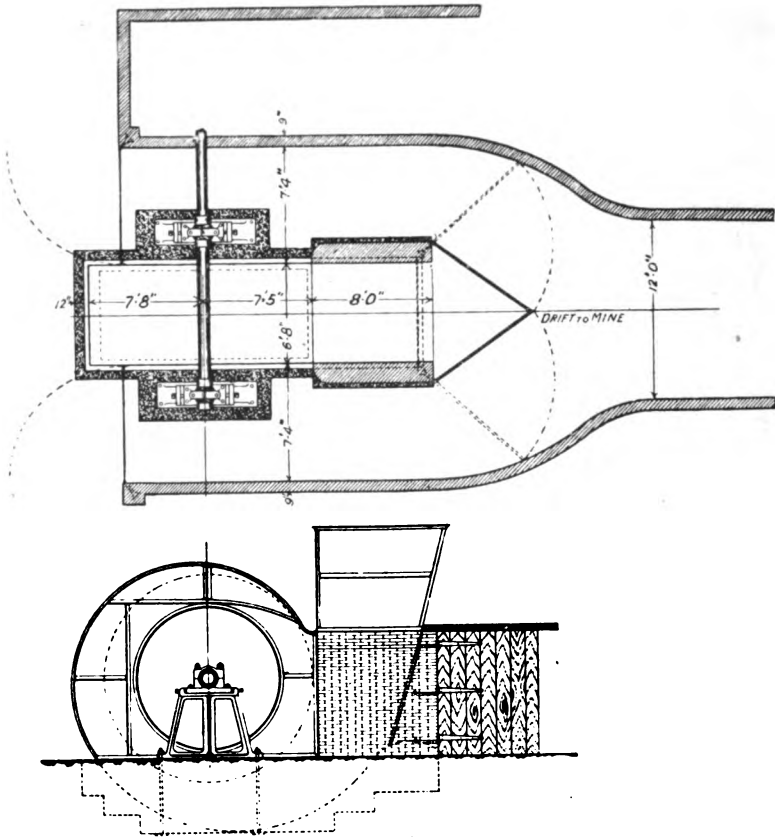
The Jeffrey Fan : General Arrangement of a Large Double-inlet Exhaust Reversible Fan.
